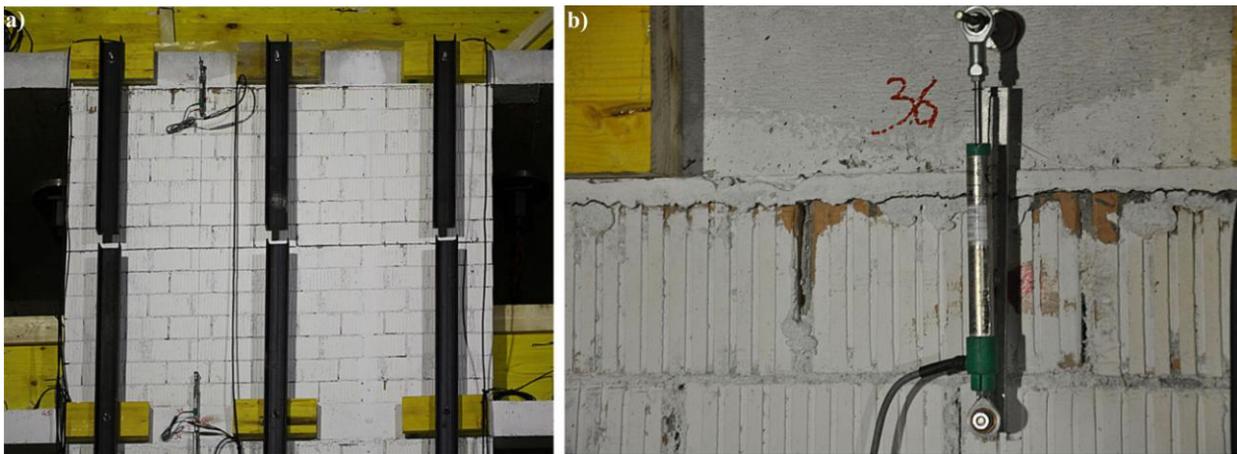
Damages in the out-of-plane loaded URM pier at the 4th storey on the North side of the structure: a) whole pier and b) crack at the top.
